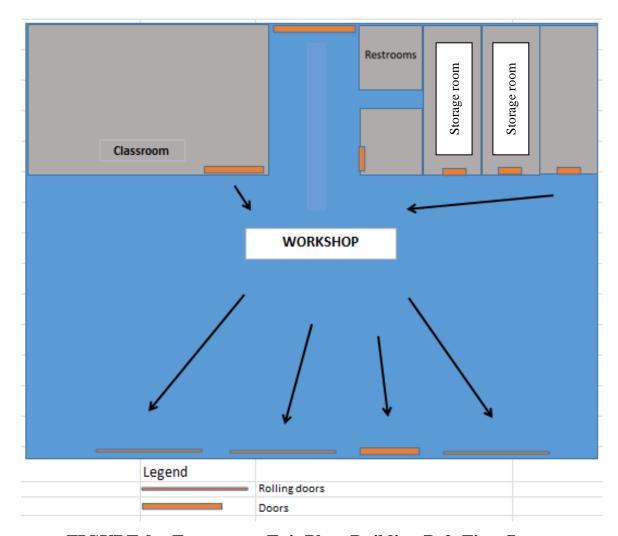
Emergency Exit Plan, Building D-2, First floor Airframe Classroom (D - 103)
